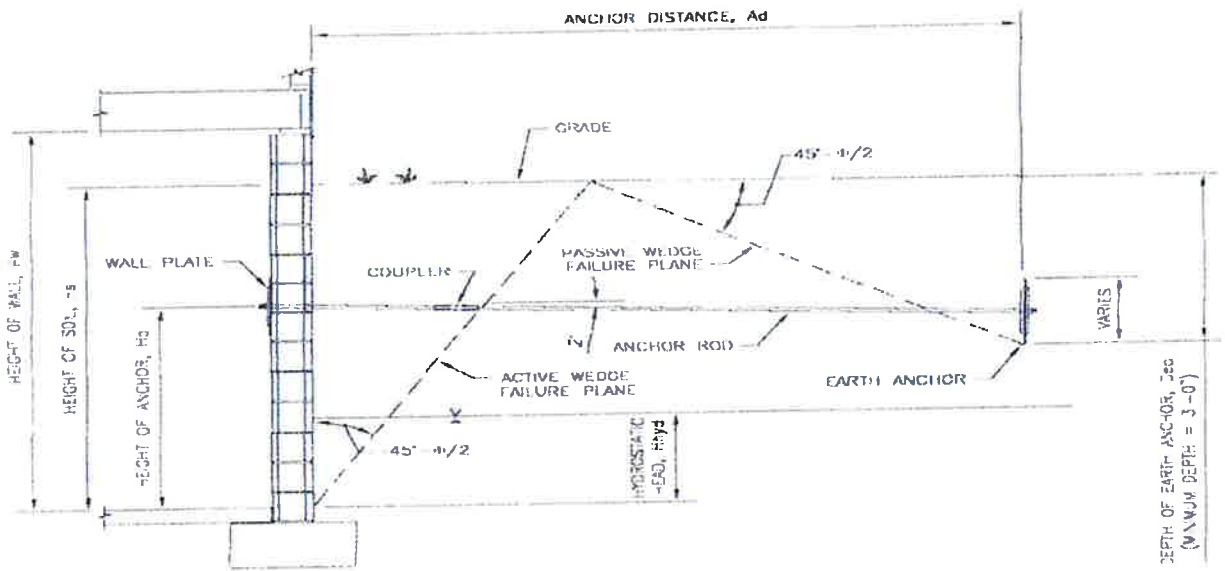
TYPICAL WALL ANCHOR ASSEMBLY
